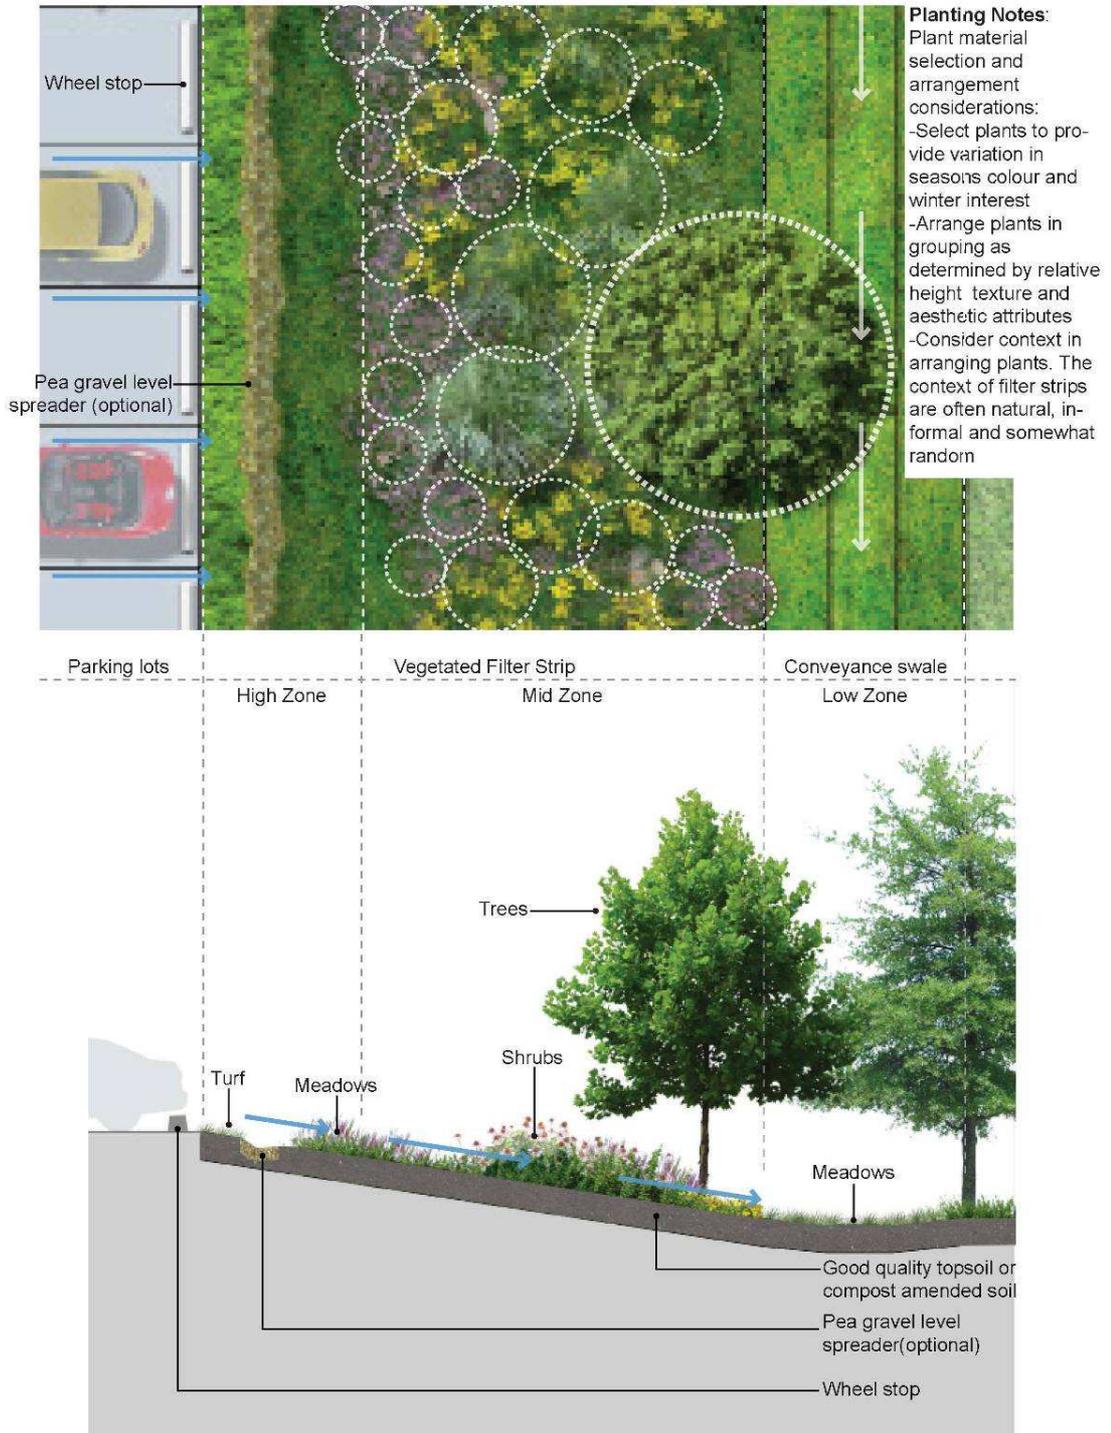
Grass filter strip plan view and cross-section; sizing and layout guidance is provided in the LID Stormwater Management Planning and Design Guide.
